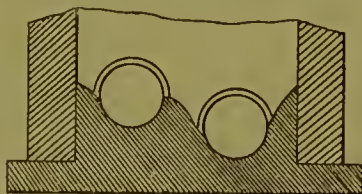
Storm Overflow, Pipe through Manhole Wall.
